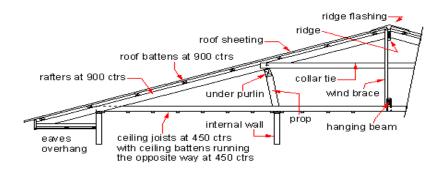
Cross section of purlin and rafter roof system showing the vital members
